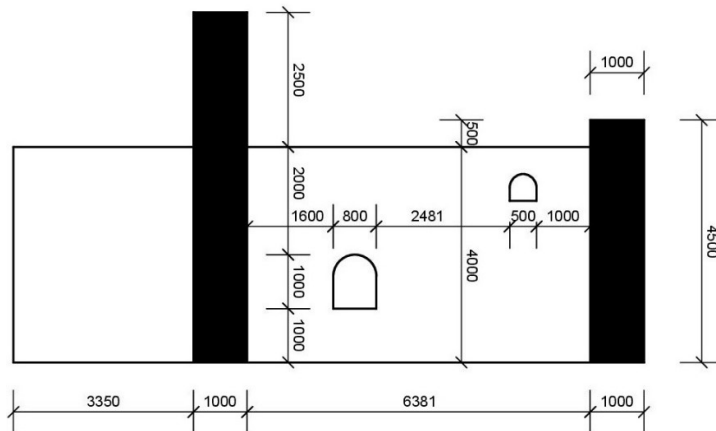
Kulumbimbi CAD Drawing Floorplan and Section B-B'
